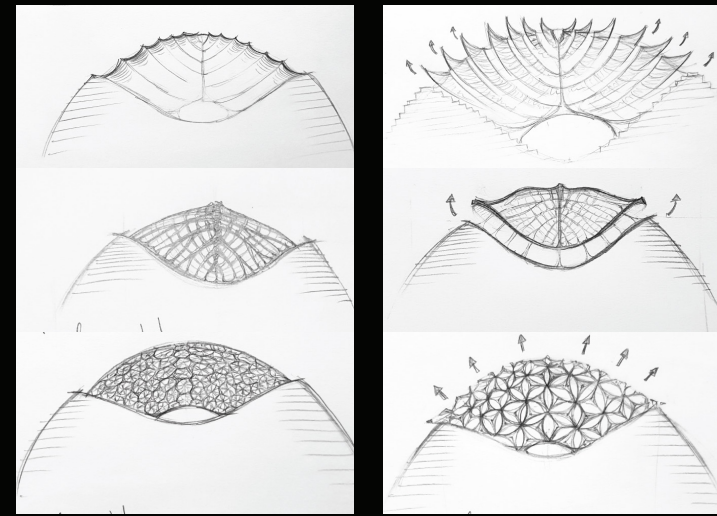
Greenhouse roof ideation sketches Peters, M. (2022)
